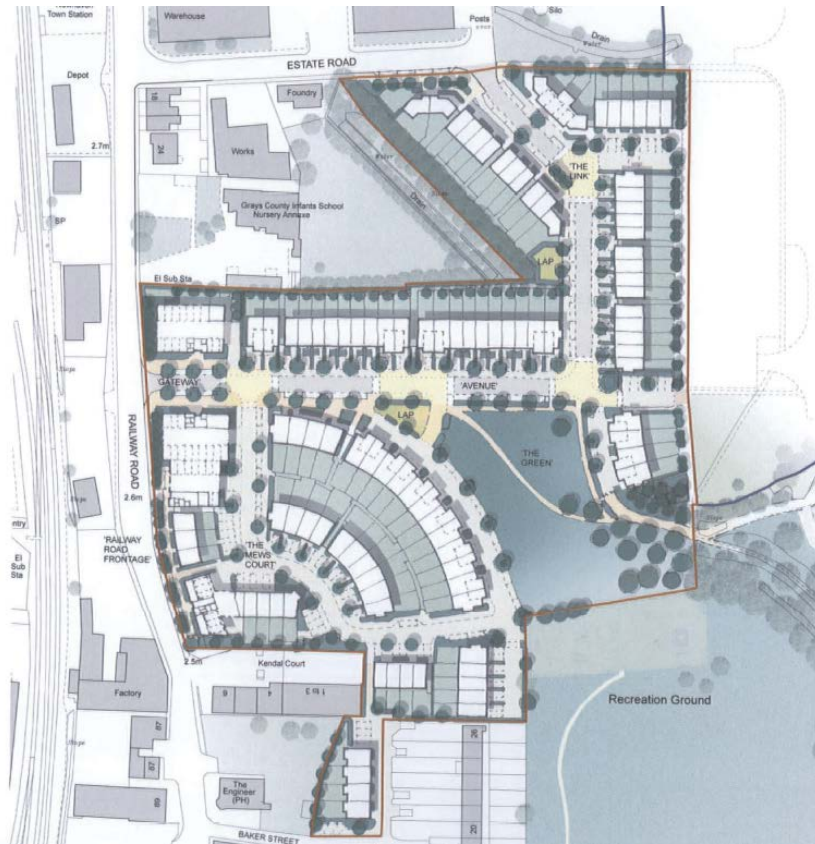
Proposed layout of future development of the former Parker pen site extracted from the outline planning application
